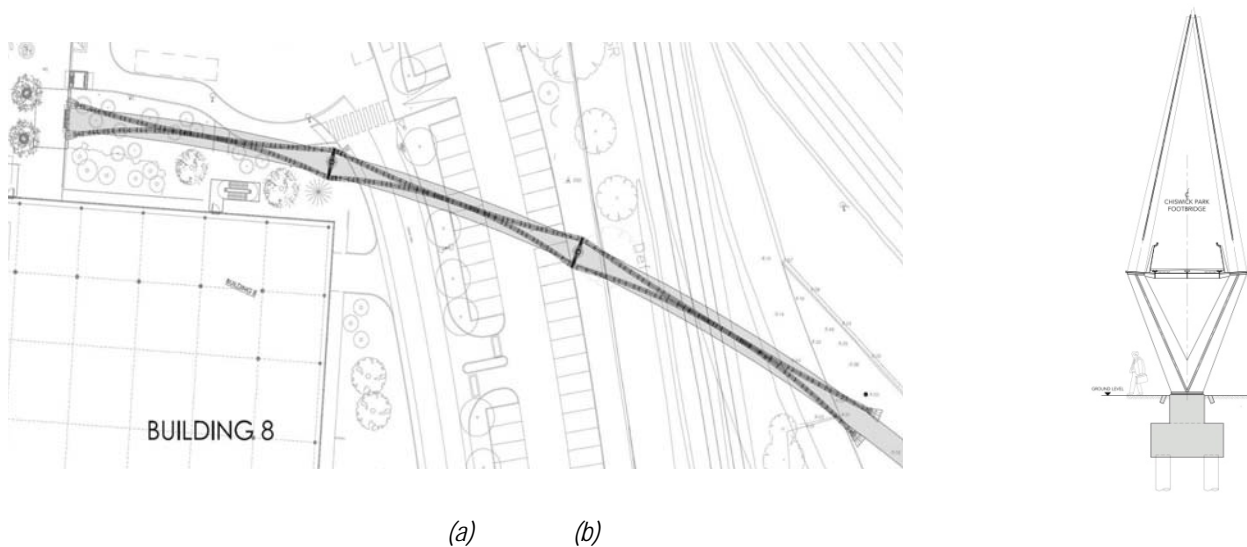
Chiswick Park Footbridge in (a) Plan and (b) Section (Expedition)
